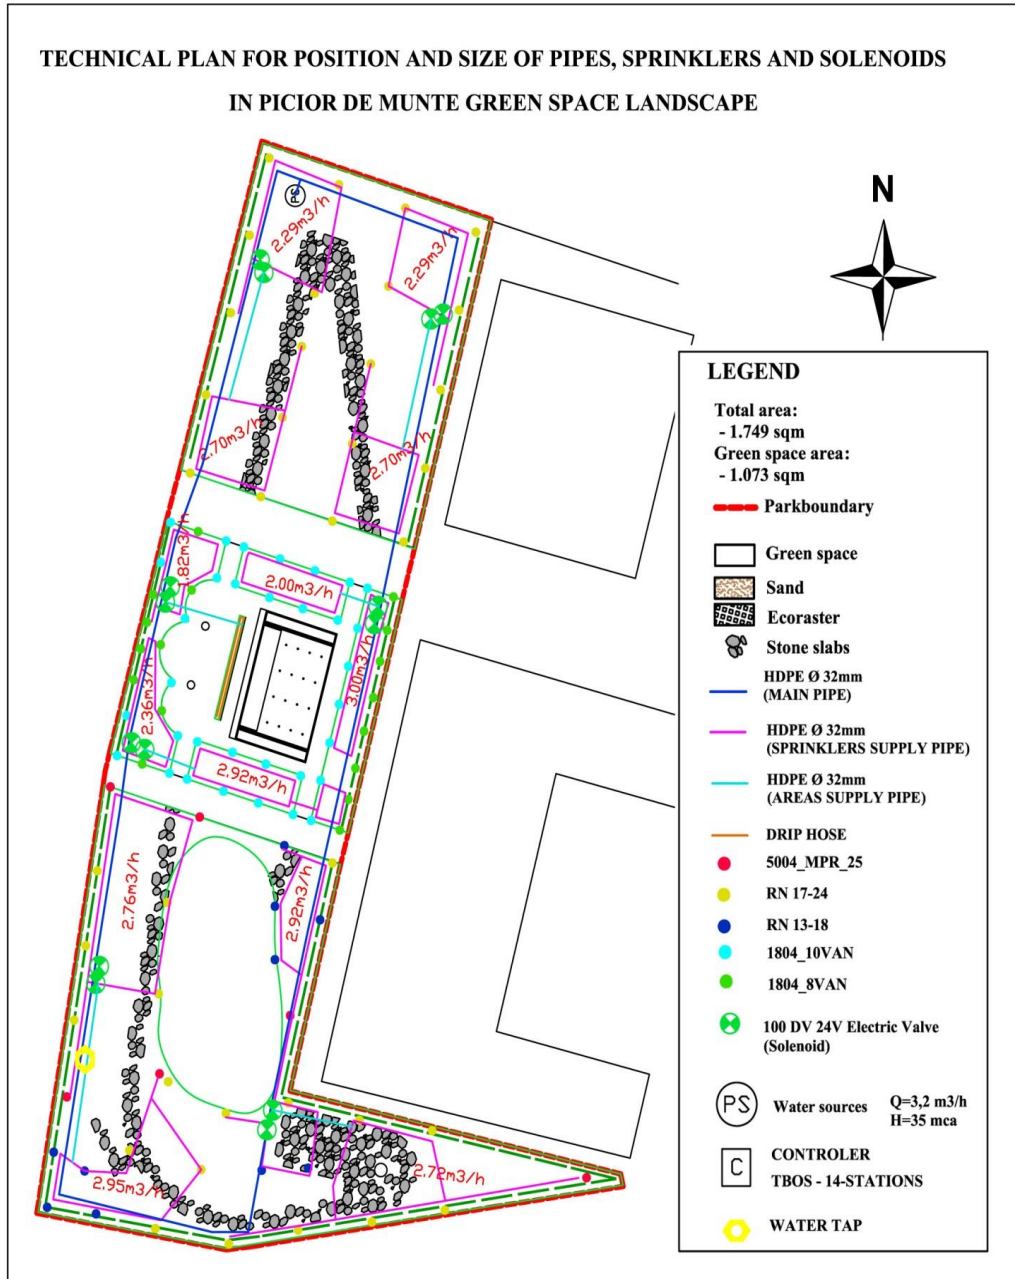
Technical plan for position and size of pipes, sprinklers and solenoids in Picior de Munte green space landscape
